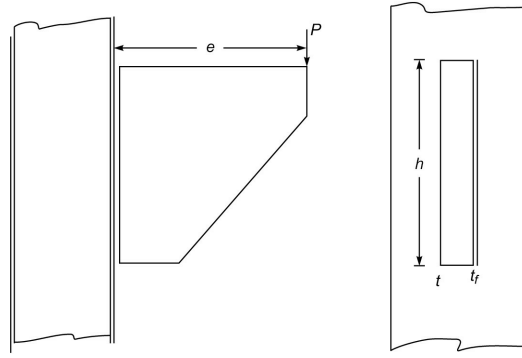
Combined axial and shear stresses on welds
